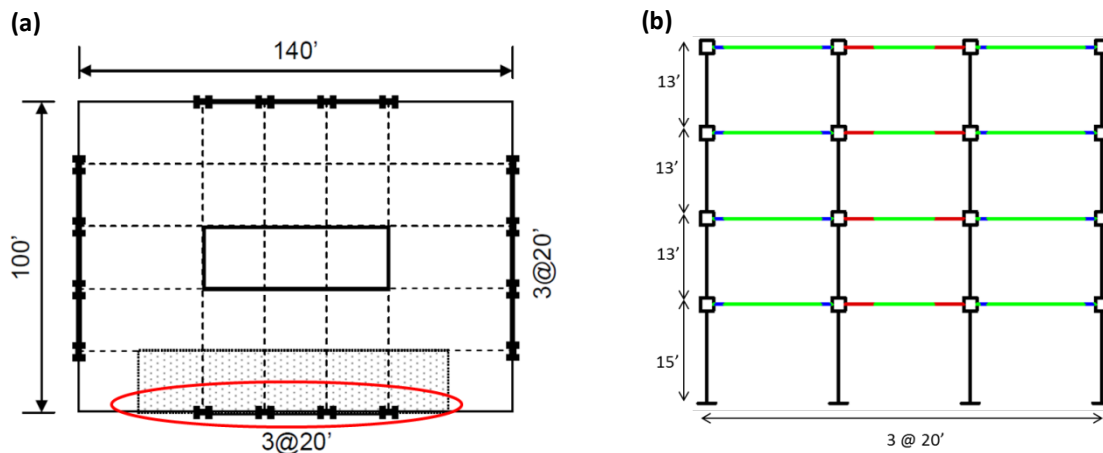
(a) Plan and (b) Elevation Views of Moment Frame Used in Analyses
